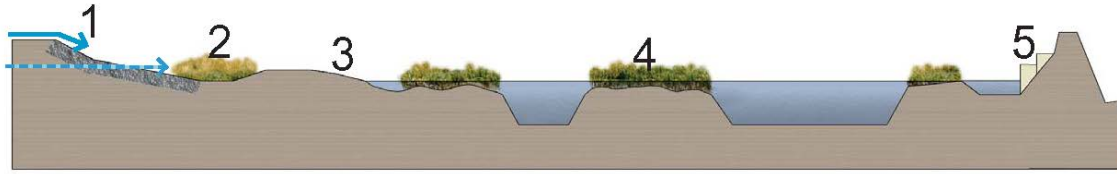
Typical Constructed Wetland Basin Design Sketch
